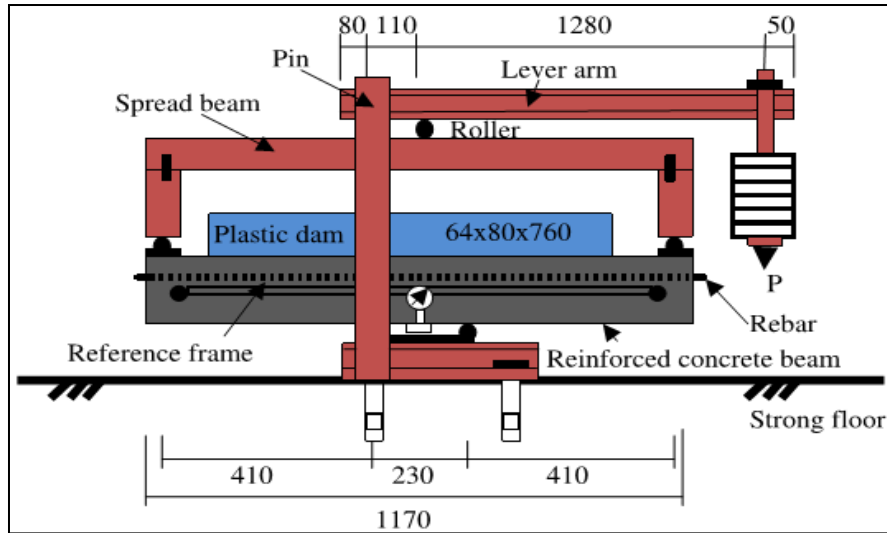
Sustained Loading setup (dimensions in mm) [12]
